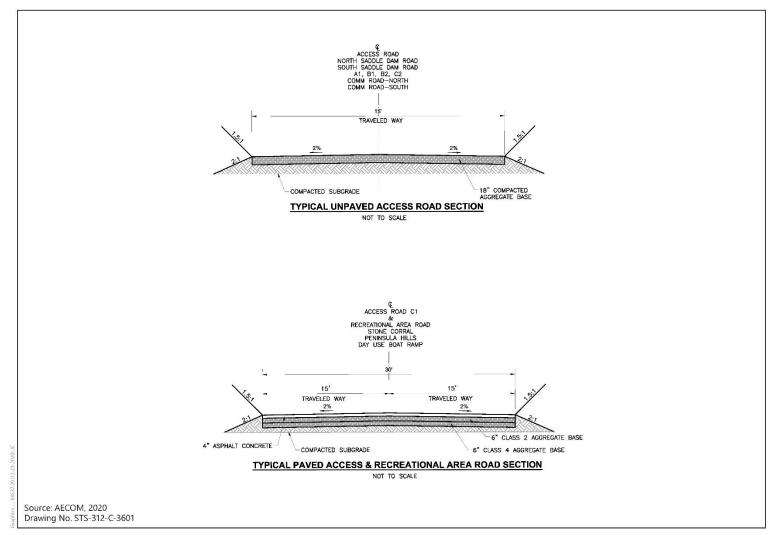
C-56 Maintenance Access Road Typical - Paved and Unpaved
